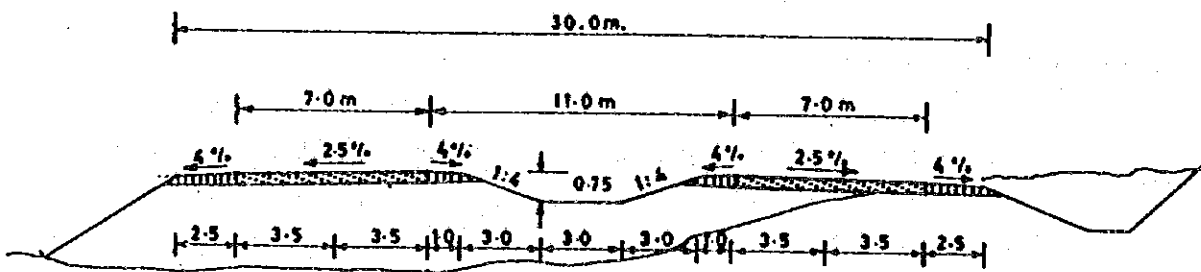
Cross Section Type I-Dual Carriage Way
